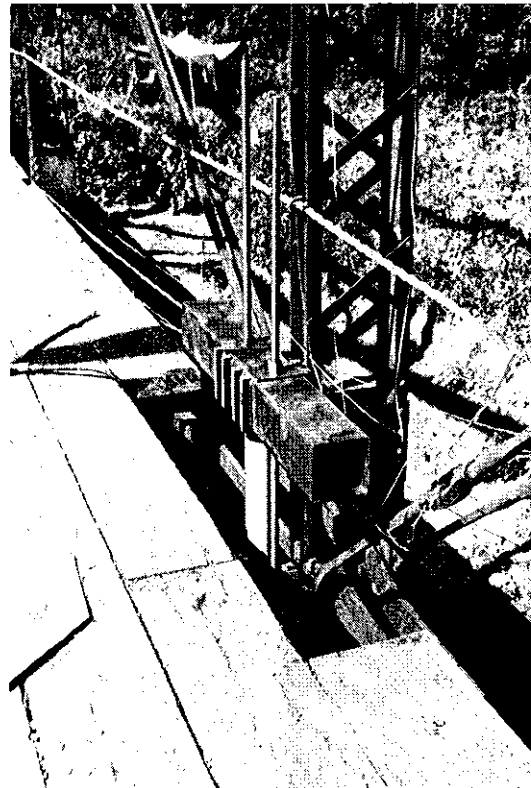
Photograph showing hydraulic jack and structural tube arrangement.
